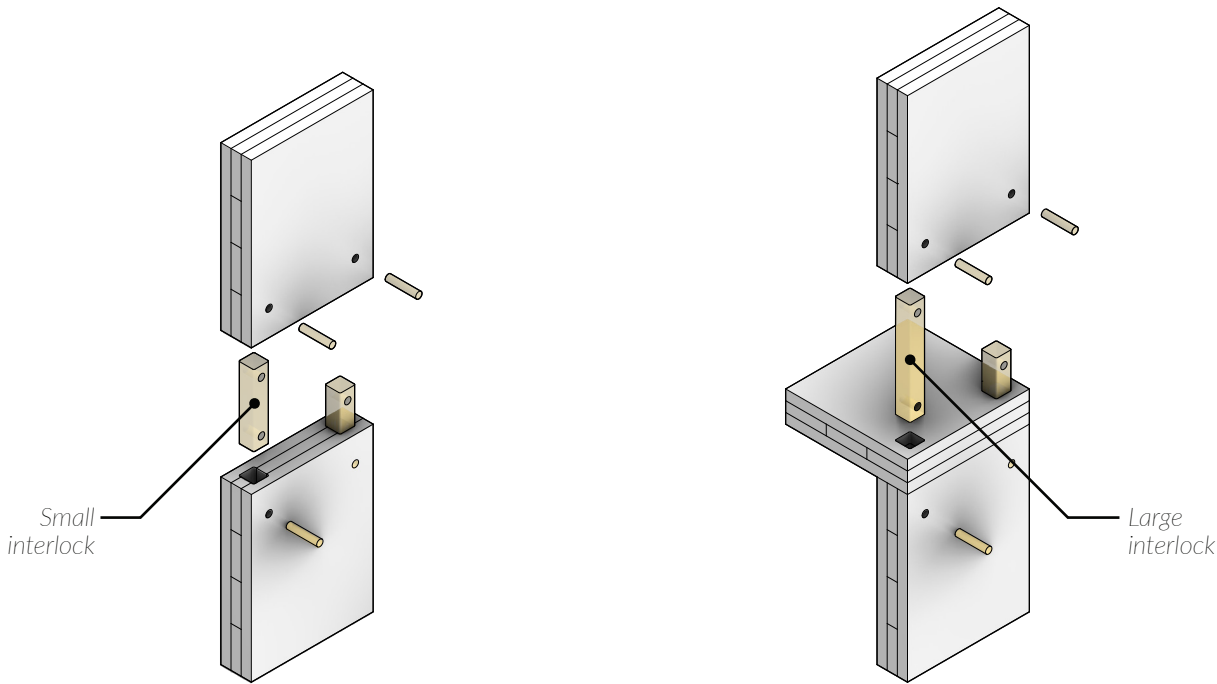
67. Exploded isometric view of joint type B (small interlock).
